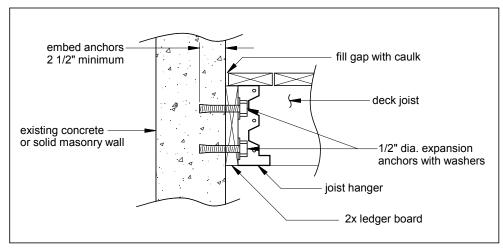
ATTACHMENT OF LEDGER BOARD-TO-FOUNDATION WALL (CONCRETE OR SOLID MASONRY)
